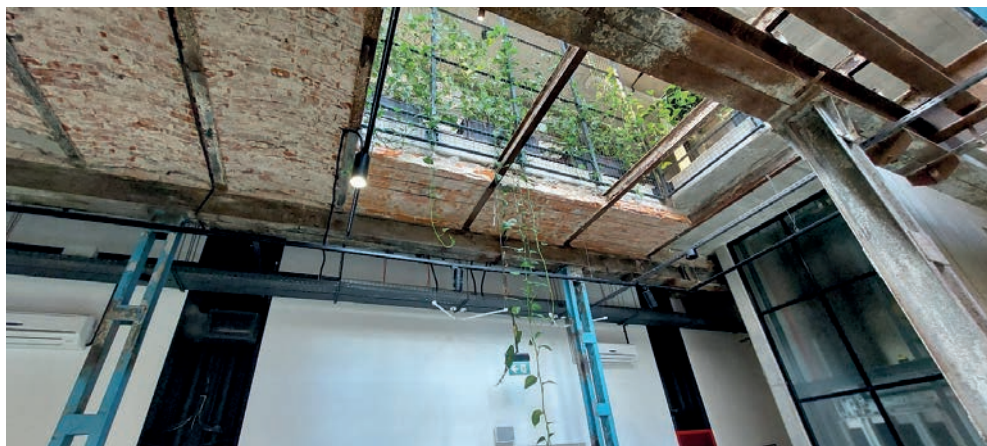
Main Building of the Żnin Sugar Factory – Using Existing Ceilings as Permanent Formwork for New Construction
